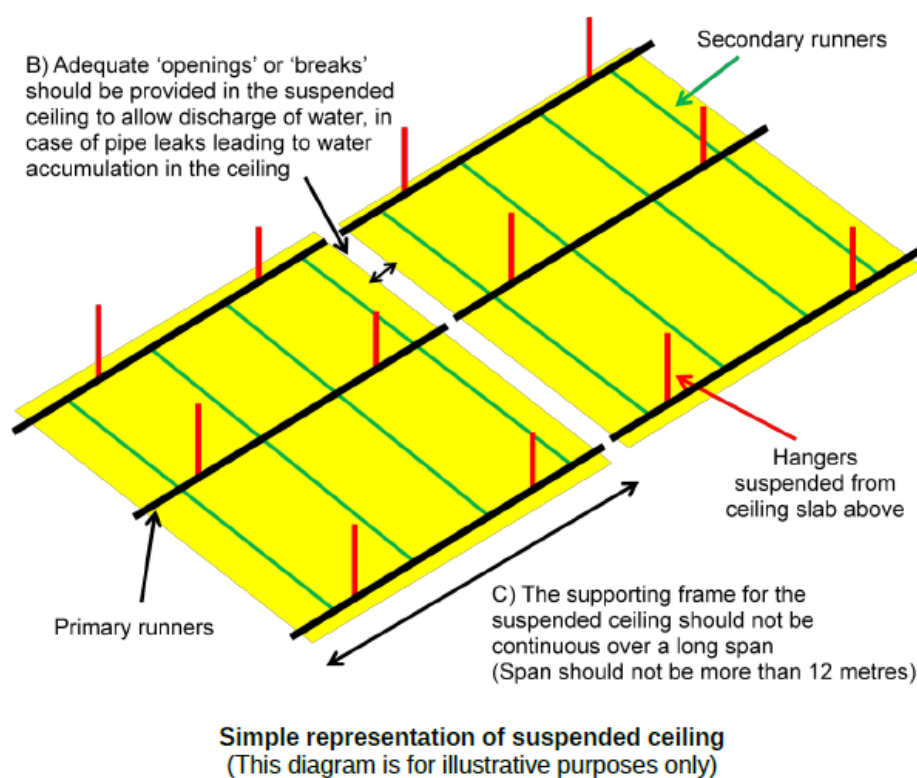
Good Practices in the Design and Installation of Suspended Ceilings
